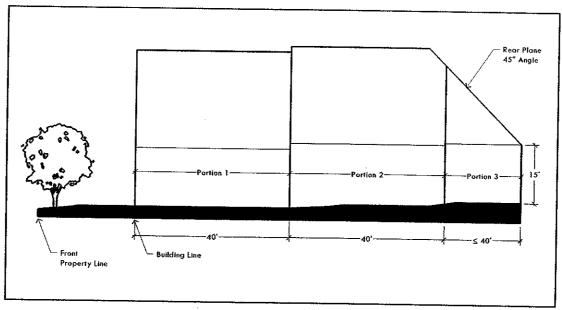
(Elevation View) Rear Setback Plane (Sloping Ground)
